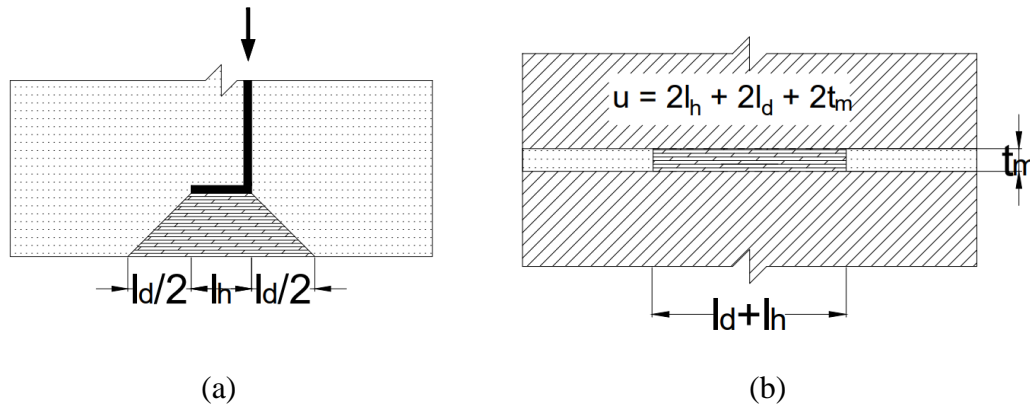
Idealised control perimeter for cavity wall tie specimens for punching failure: mortar joint section (a), front view (b).
